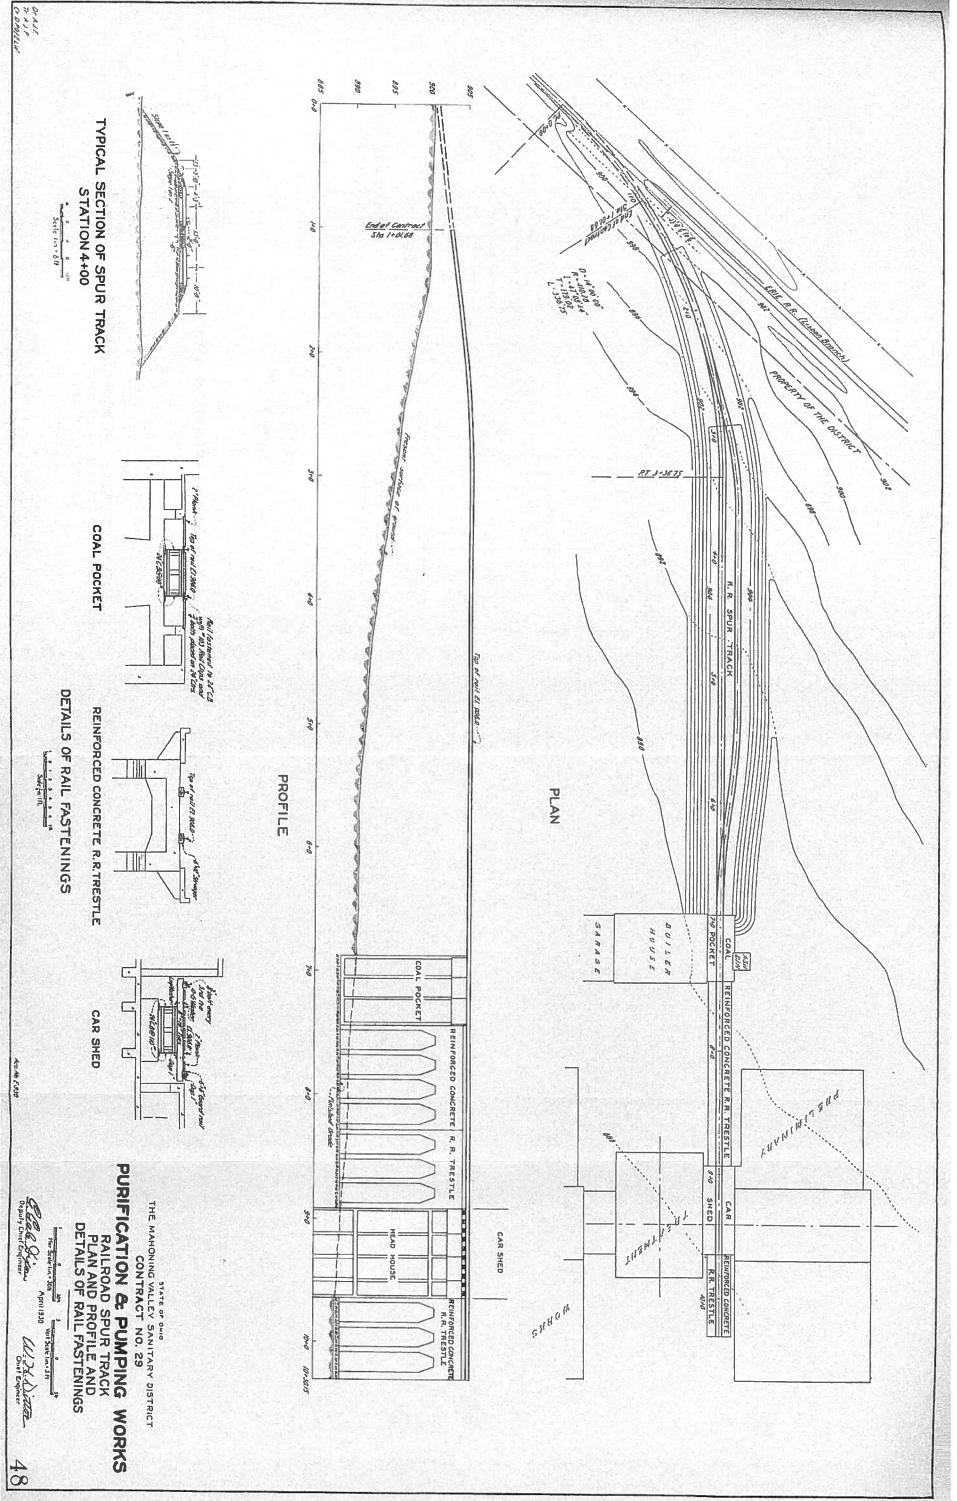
Dwg. 48 - Railroad Spur Track - Plan.tif
